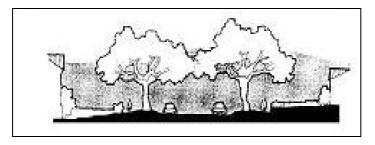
Typical section of an inner residential street with a detached dwelling typology.
